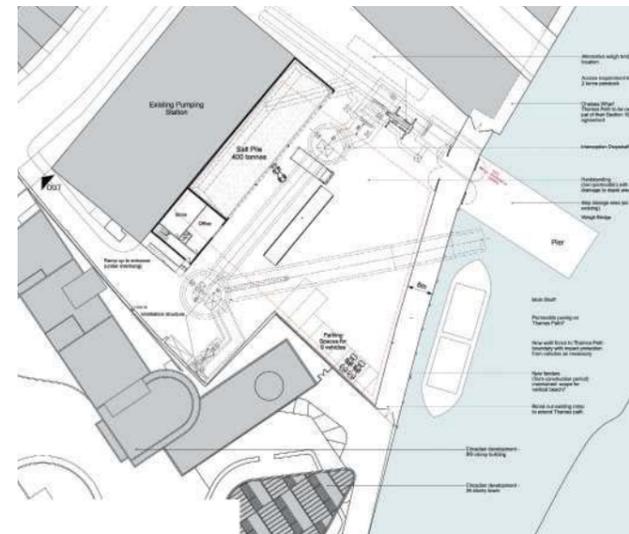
Proposed plan from Design Council CABE sketch review (not to scale)
